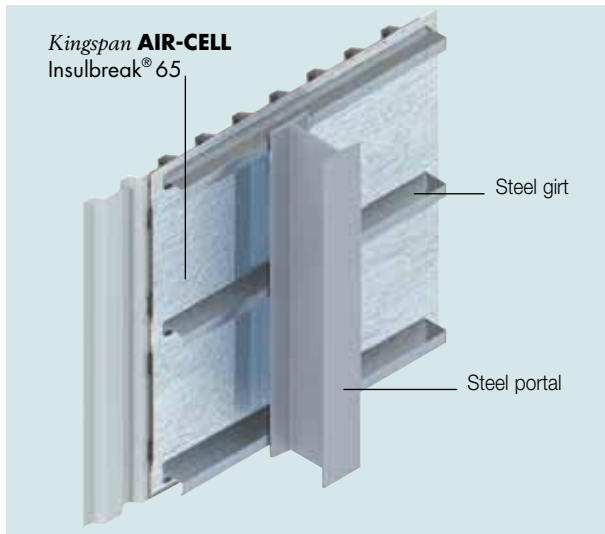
Kingspan AIR-CELL Insulbreak® 65 in a warehouse wall installation
